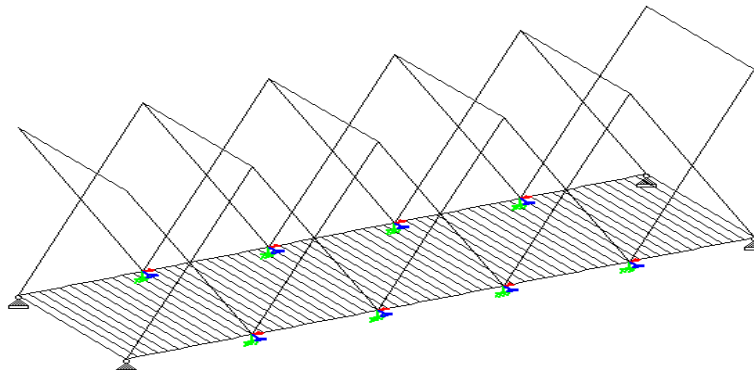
Plan view of Pedestrian bridge made up of Steel section (S1)
